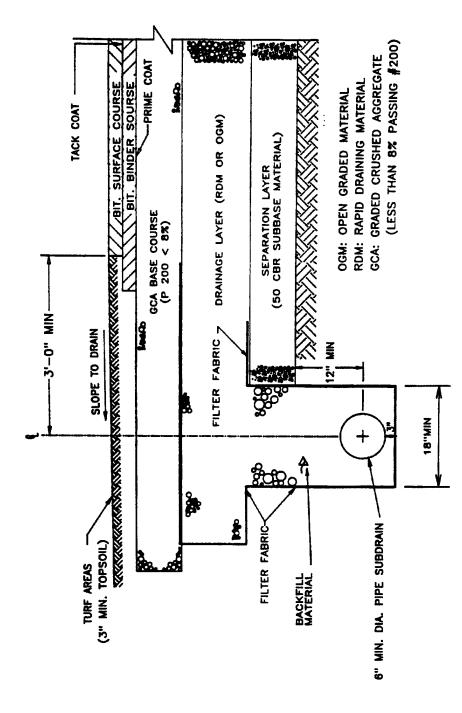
Typical Pavement Edge Subdrain for Bituminous Pavements
